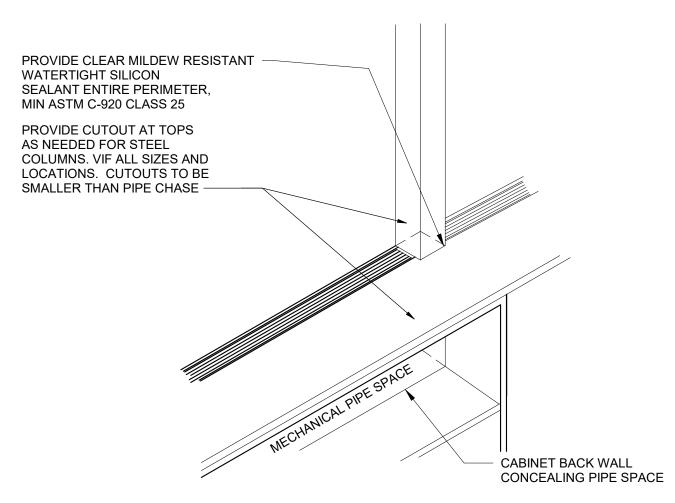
DETAILS AND ELEVATIONS, INCLUDED BUT NOT LIMITED TO
